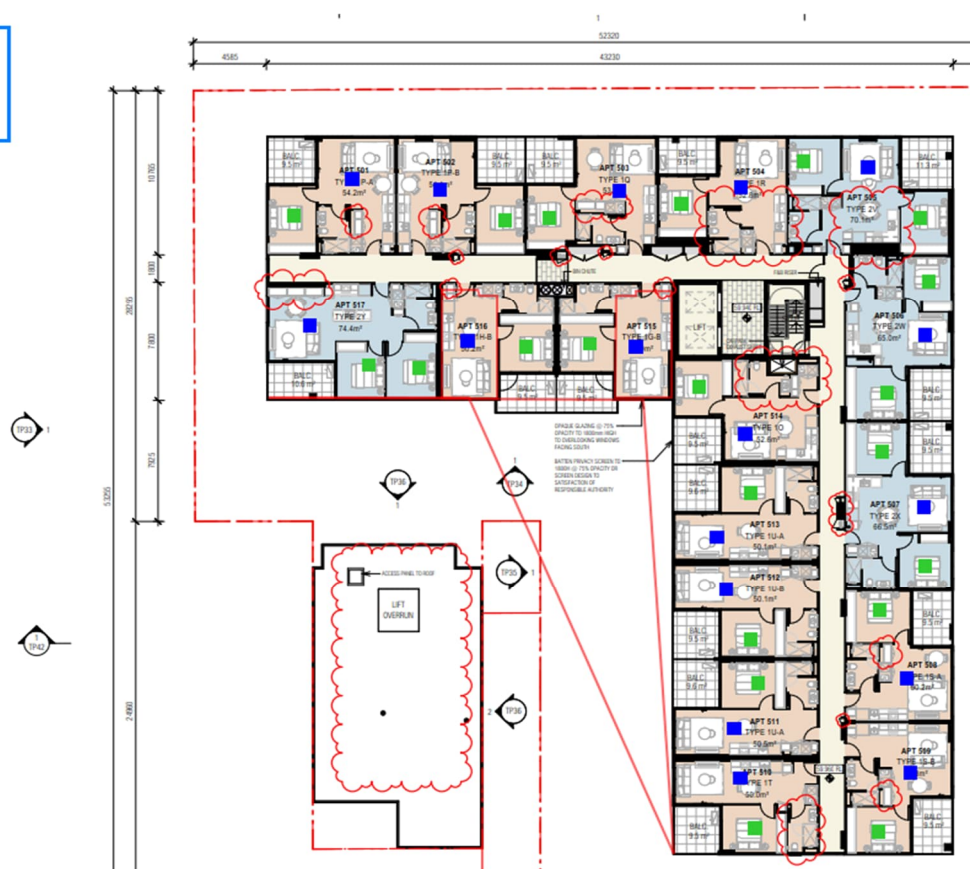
Daylight Access Level 5 – Living Rooms and Bedrooms
